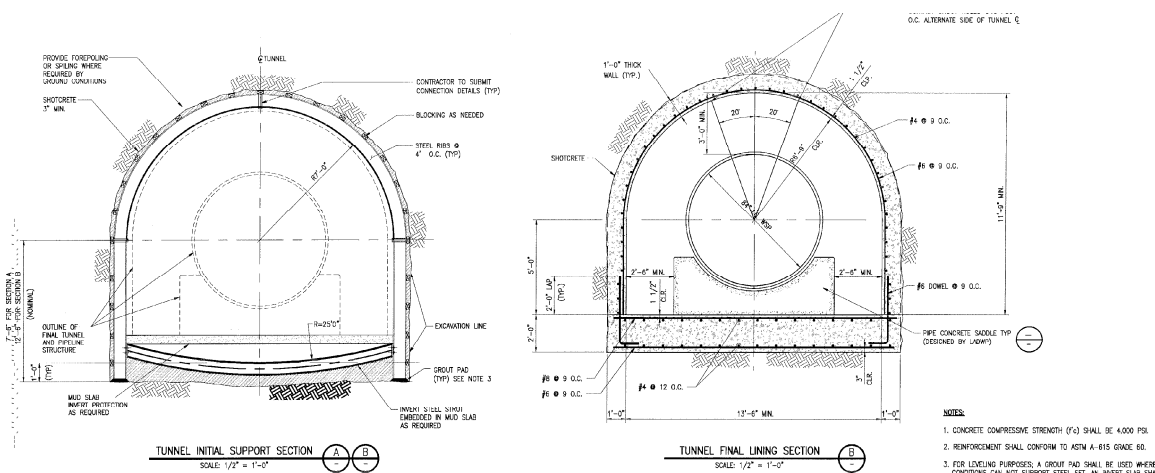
Typical cross section for tunnel lining system, initial support and final lining
